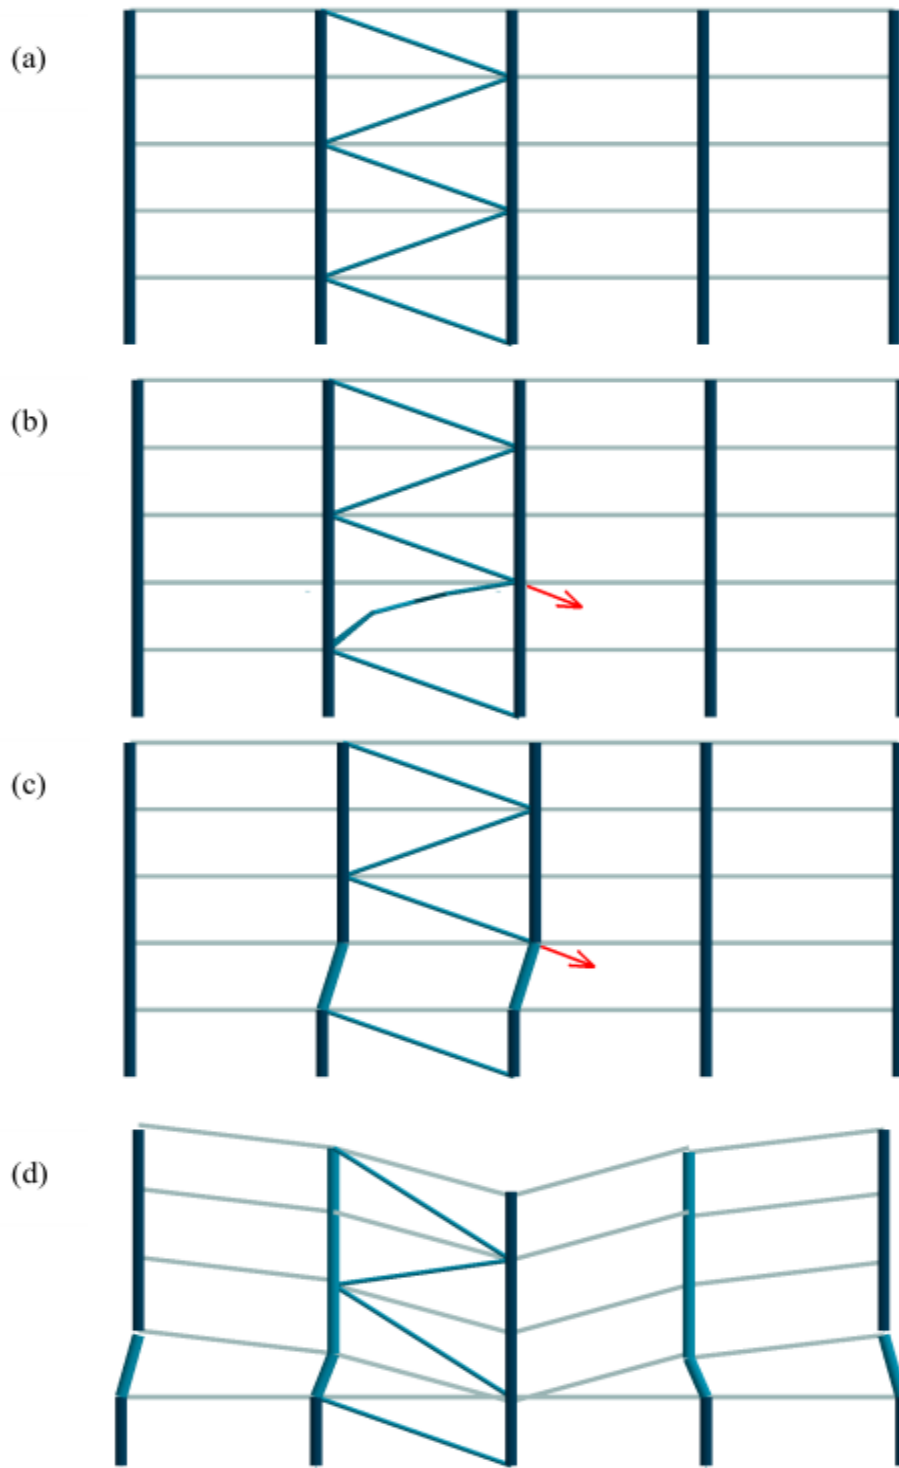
The stages of instability-type progressive collapse, including (a) the primary construction with a bracing truss, (b) the initial failure in the girder, (c) the loss of steadiness till the lost part of the truss then (d) the crash till instability. (Räty Johan, 2010).
